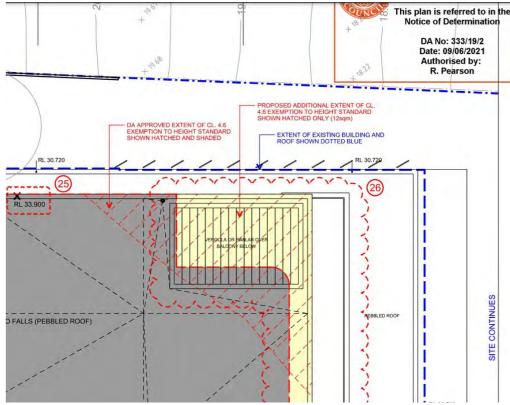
Extract of Approved Plan DA_100_50 Rev. 05 per DA 333/19/2
